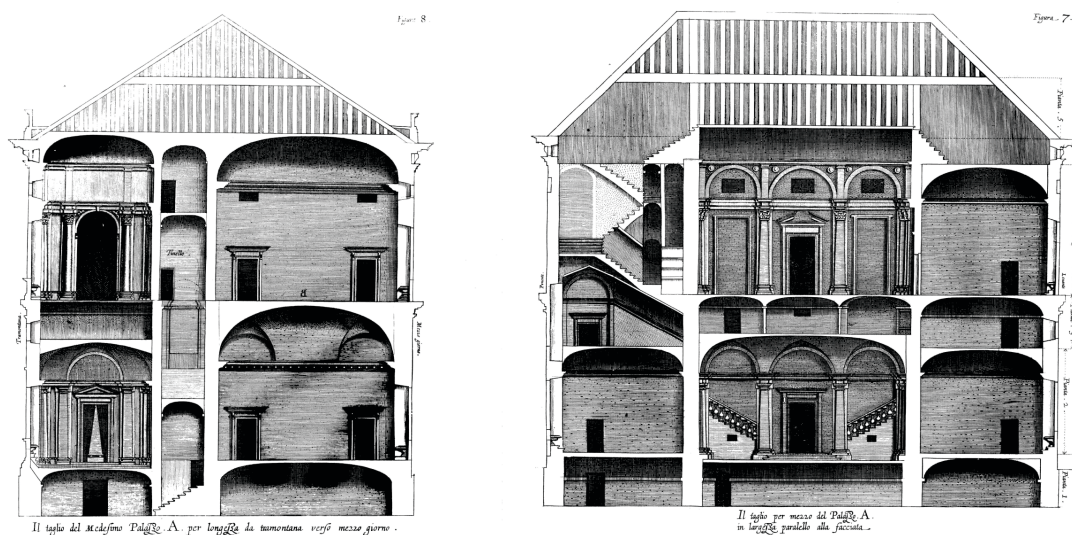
Palazzo A, crosssection perpendicular to the façade (left), crosssection parallel to the façade (right); engravings by Nicolaes Ryckemans, 1622.
